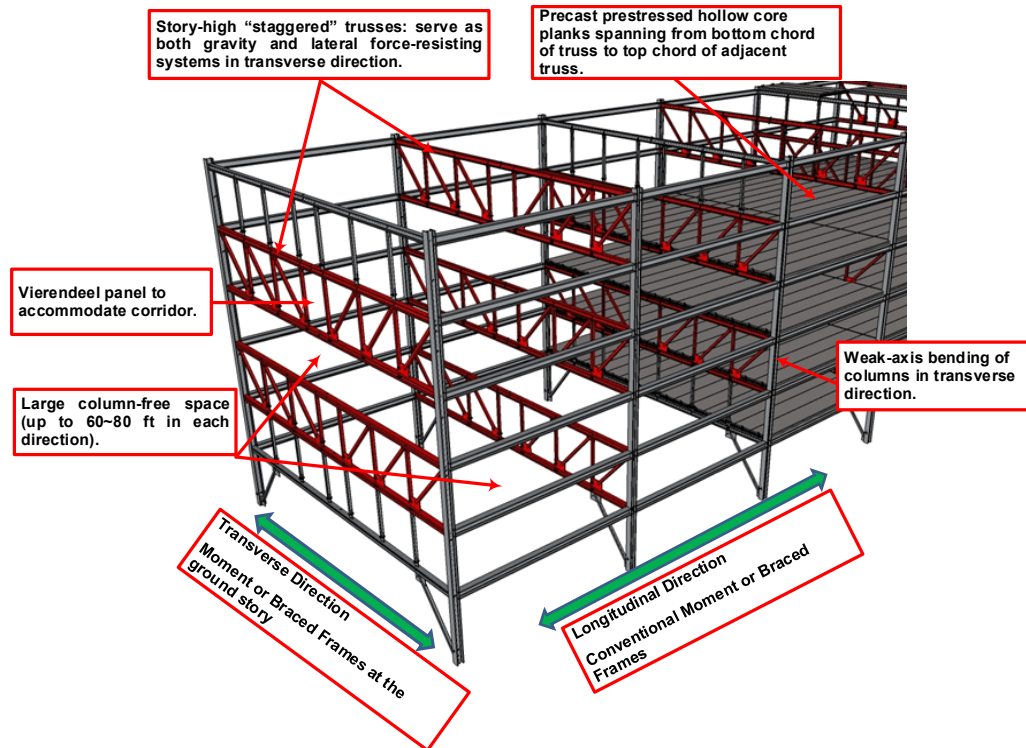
Features of Staggered Truss Framing (STF) System.
